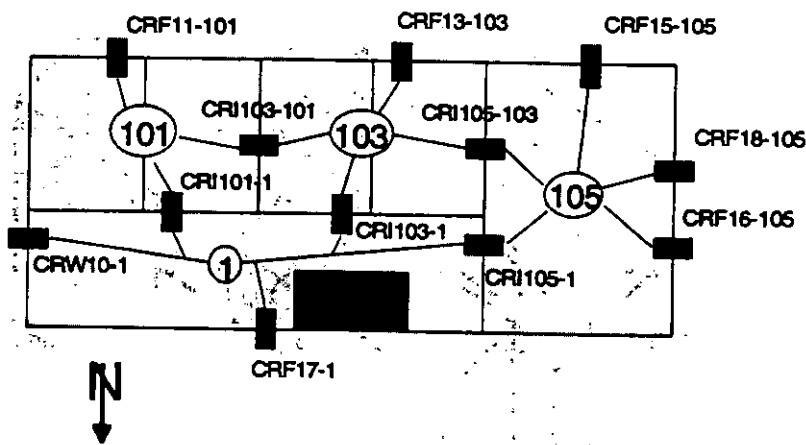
Typical network arrangement for Building 4 (Floor 2)
